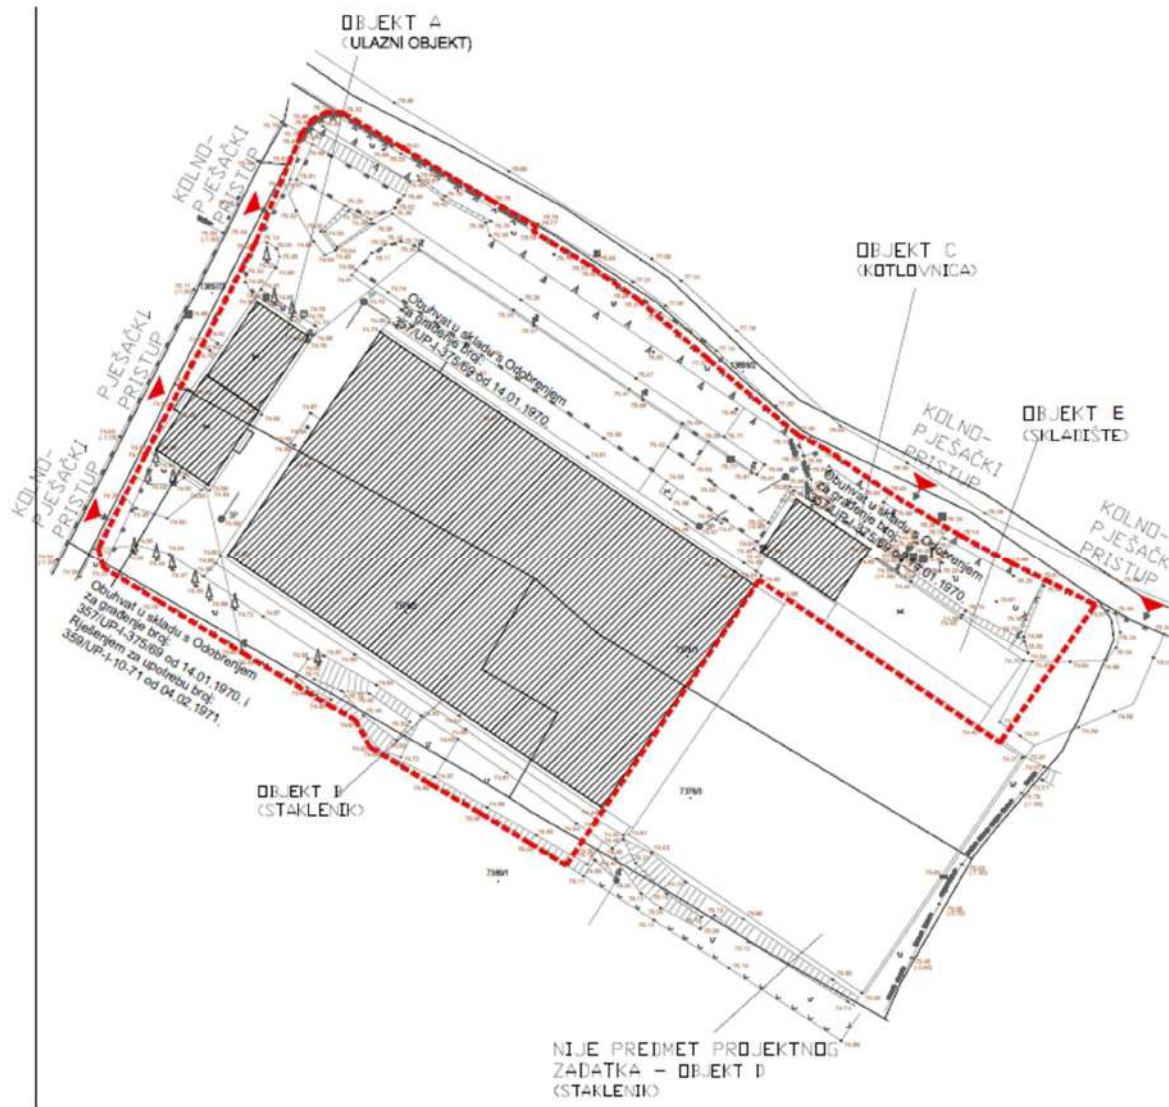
Existing Site Plan - c.p. No. 7376/2, c.m. Split; source: Main Design, 09/2023
